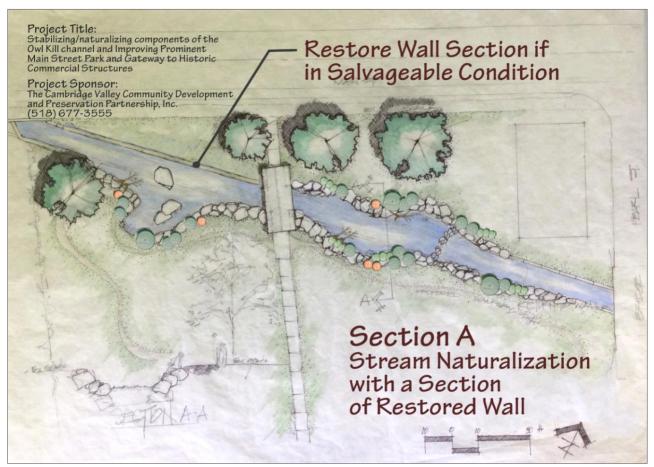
Proposed Preliminary Owl Kill Stream Site Plan for Section A
